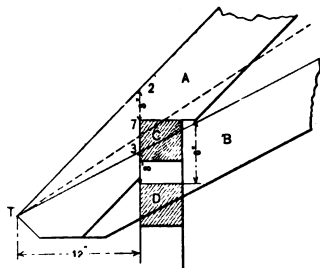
Vertical Section, Showing Rafters and Plates.
